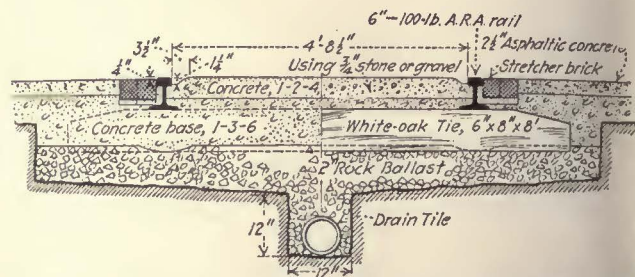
Typical Cross-Section of Track for Paved Streets with Concrete Paving Used in Chattanooga
